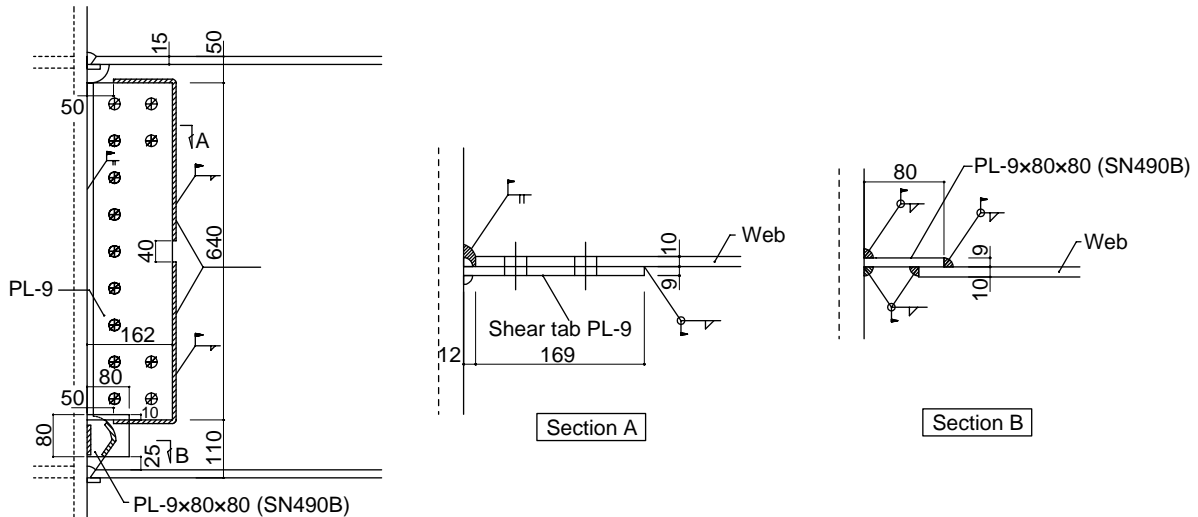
Details of the connection with modified supplemental weld
